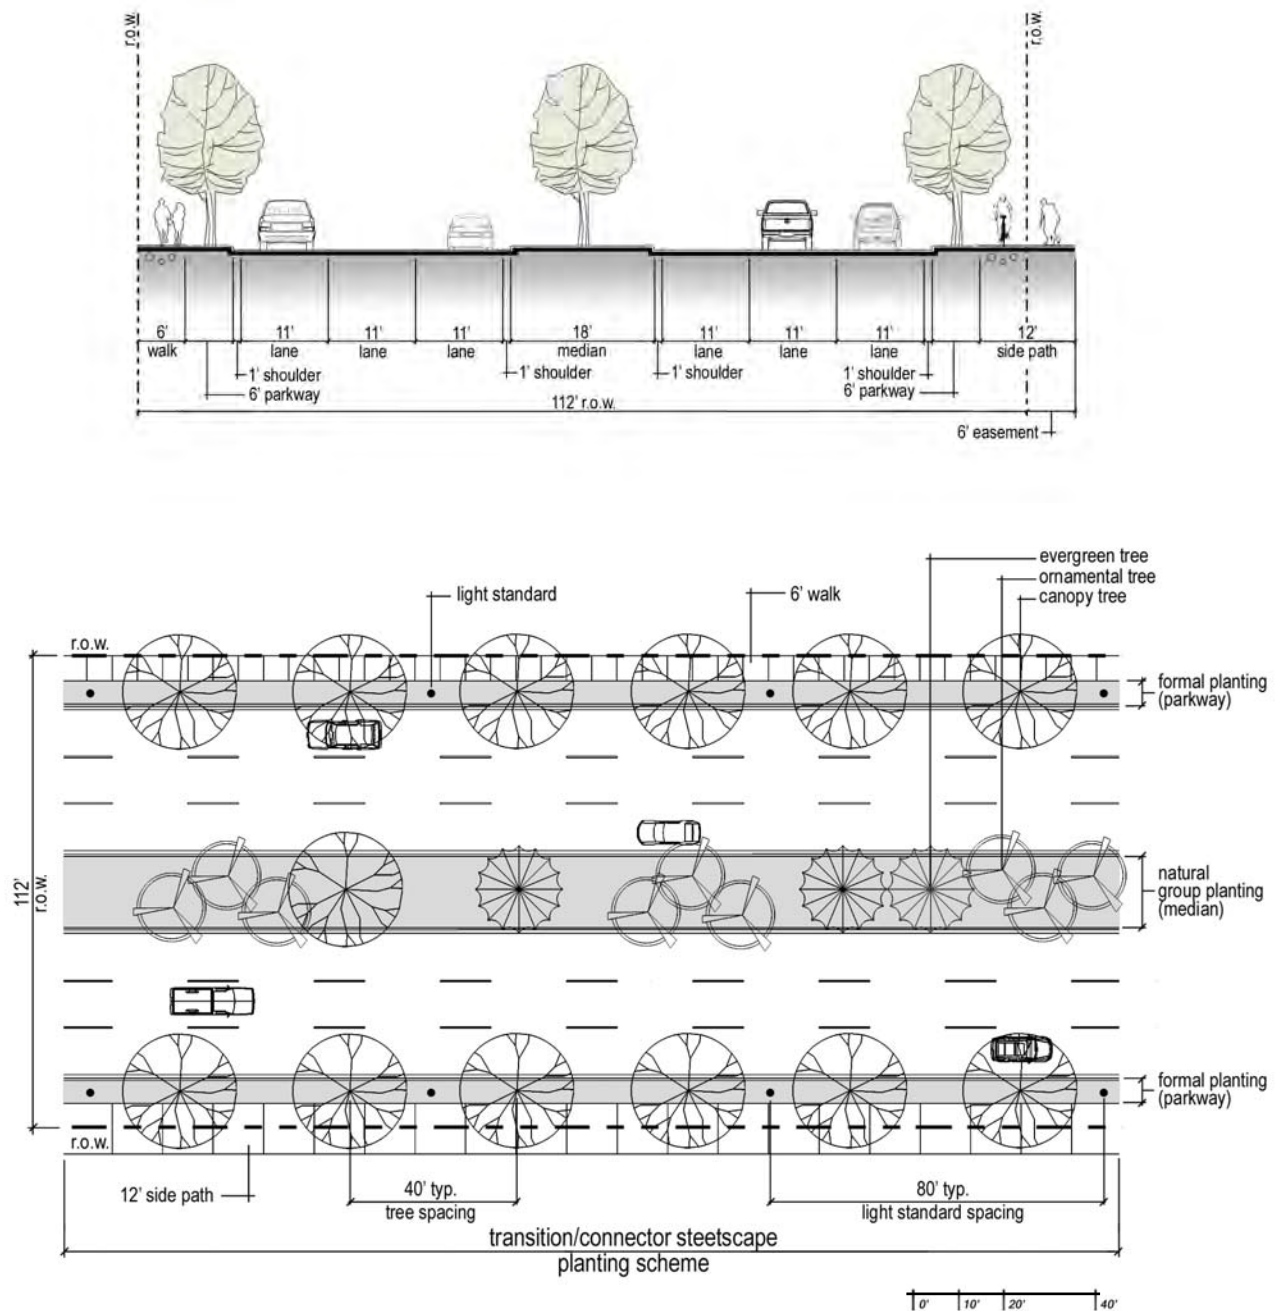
Typical Connector Arterial Section & Plan: Principal Arterial
